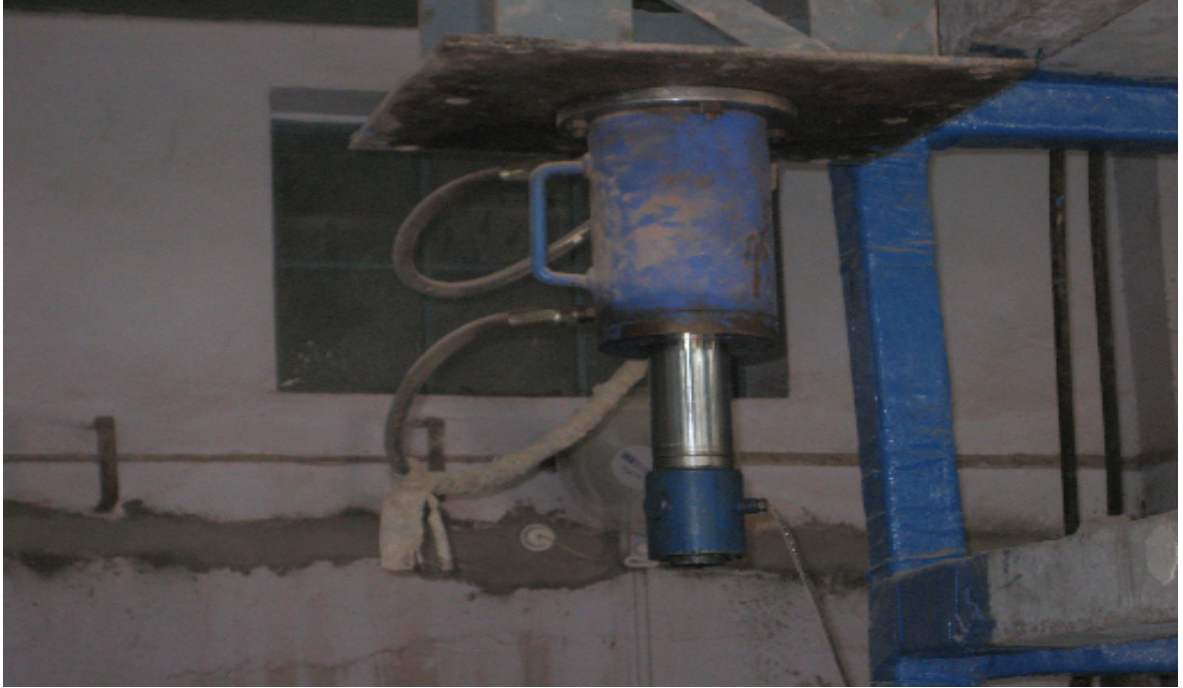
TESTING JACK SHOWING FULL TRAVEL OF THE JACK
